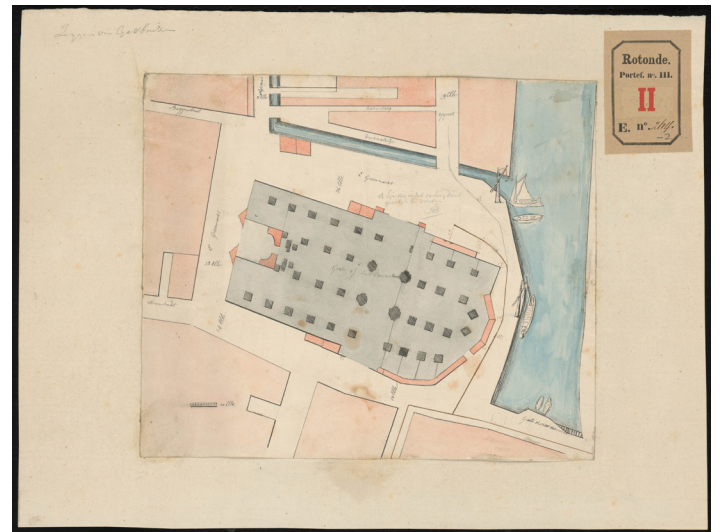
Drawing of the floorplan of the Sint Laurens Church (Stadsarchief Rotterdam, 1680)
